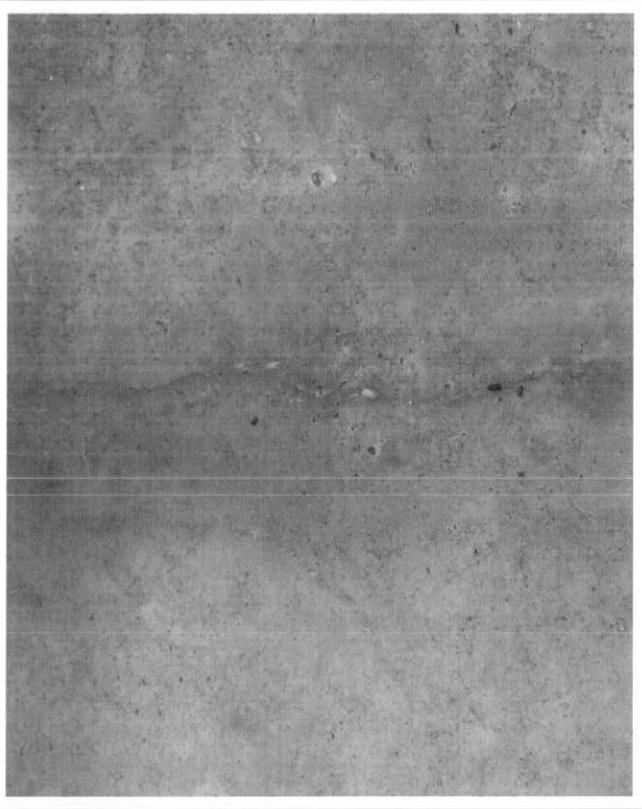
CLOSEUP OF HORIZONTAL CRACKING IN TOP FASCIA OF GIRDERS IN SPAN # 2.
